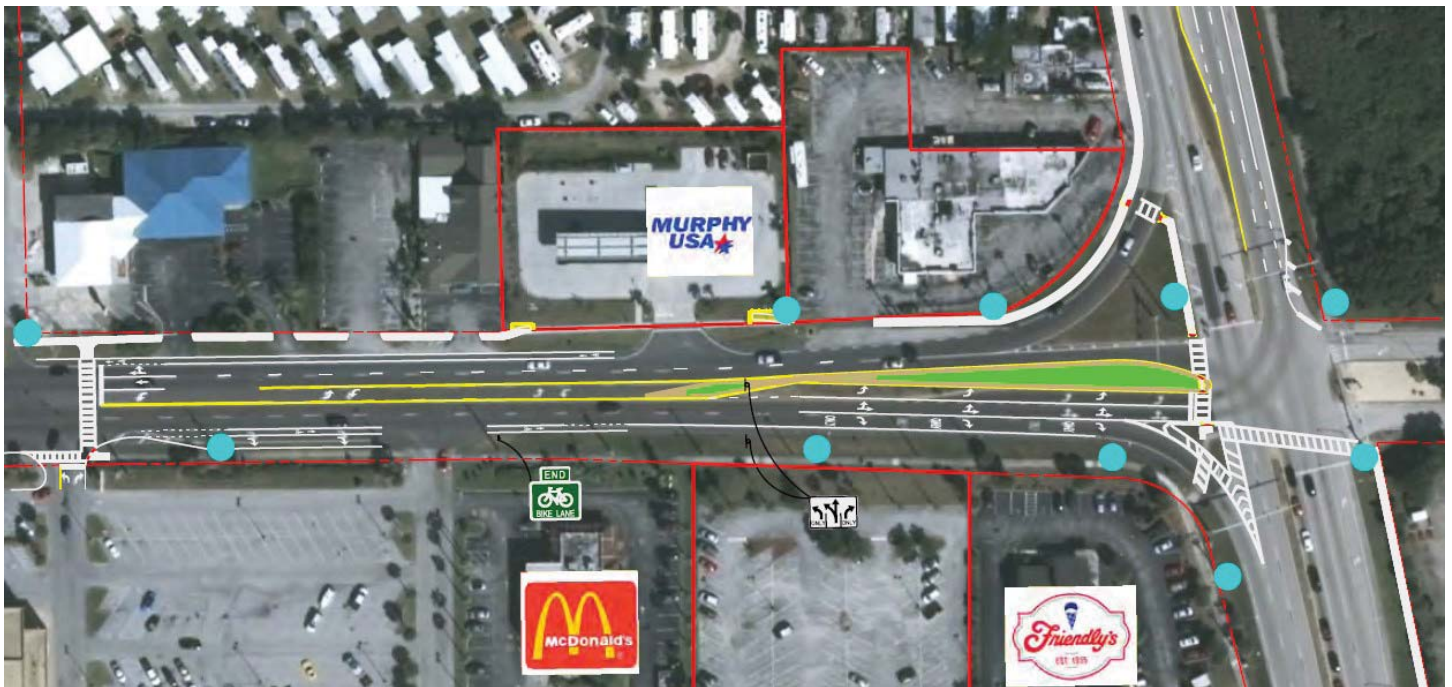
Plan View of Group 1 Improvements – Bulb out at South Patrick Drive and Shopping Center Access Modifications
